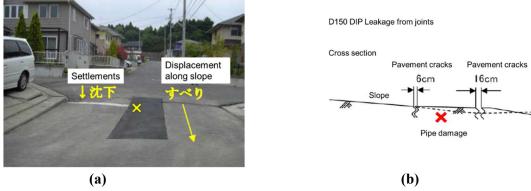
Example 1 of location of a pipe damage: (a) Paved road after repair works and (b) illustrated cross section of the site (JWWA 2012).
